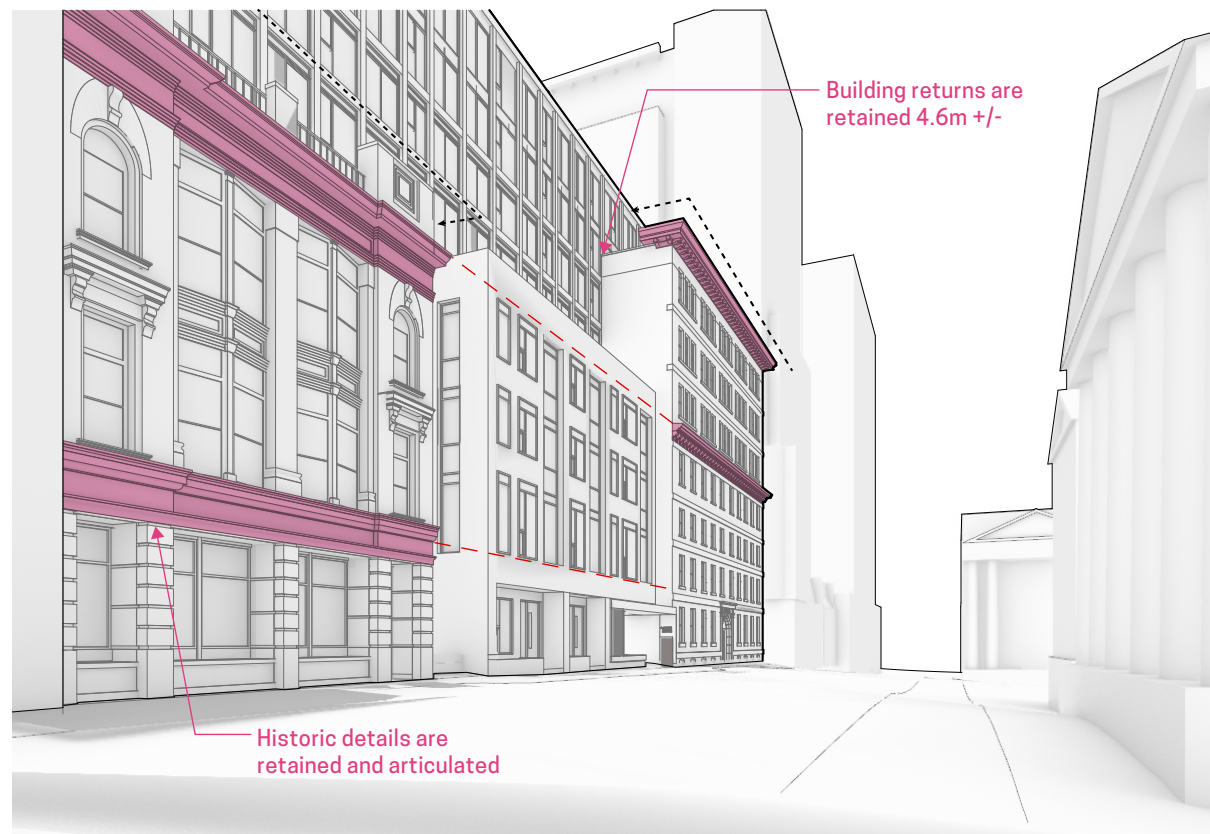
b Streetwall Width: Reveals at streetwall and retention of building returns allow for articulation of historic details.
